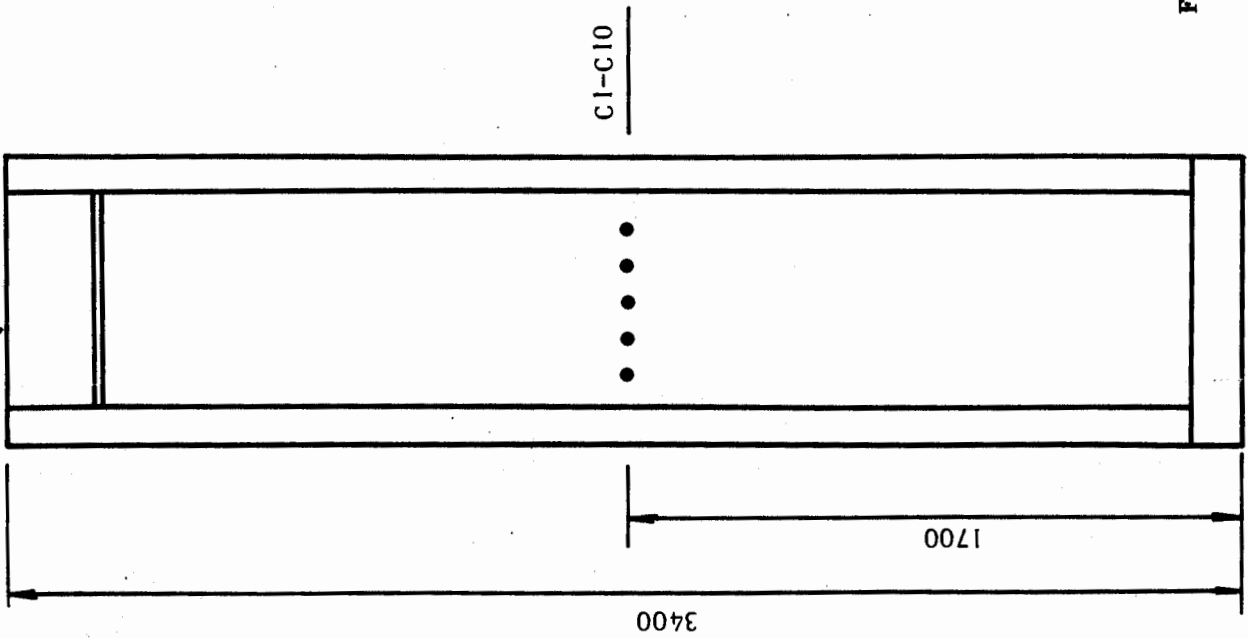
DETAILS OF HILTI SHEAR CONNECTOR LOCATIONS AND CONCRETE INFILL - APPLICABLE TO TESTS TE 80470 AND TE 80471
